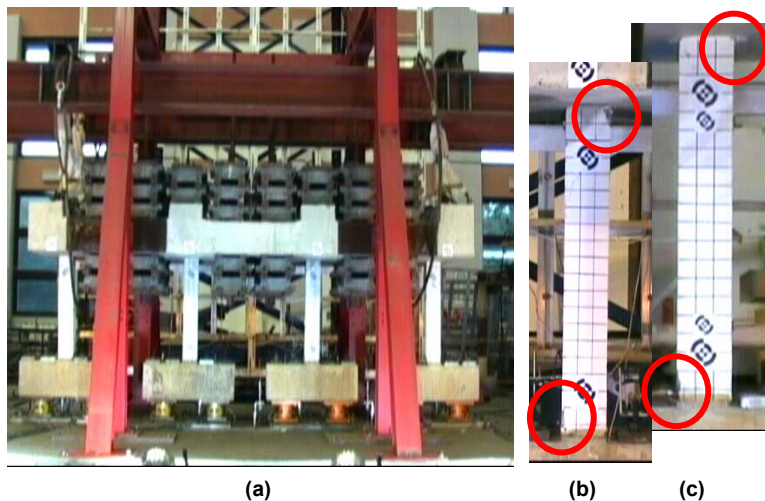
The shake table test after being subjected to first table motion (a) the specimen (b) cover spalling, column C (c) cover spalling, column D.
